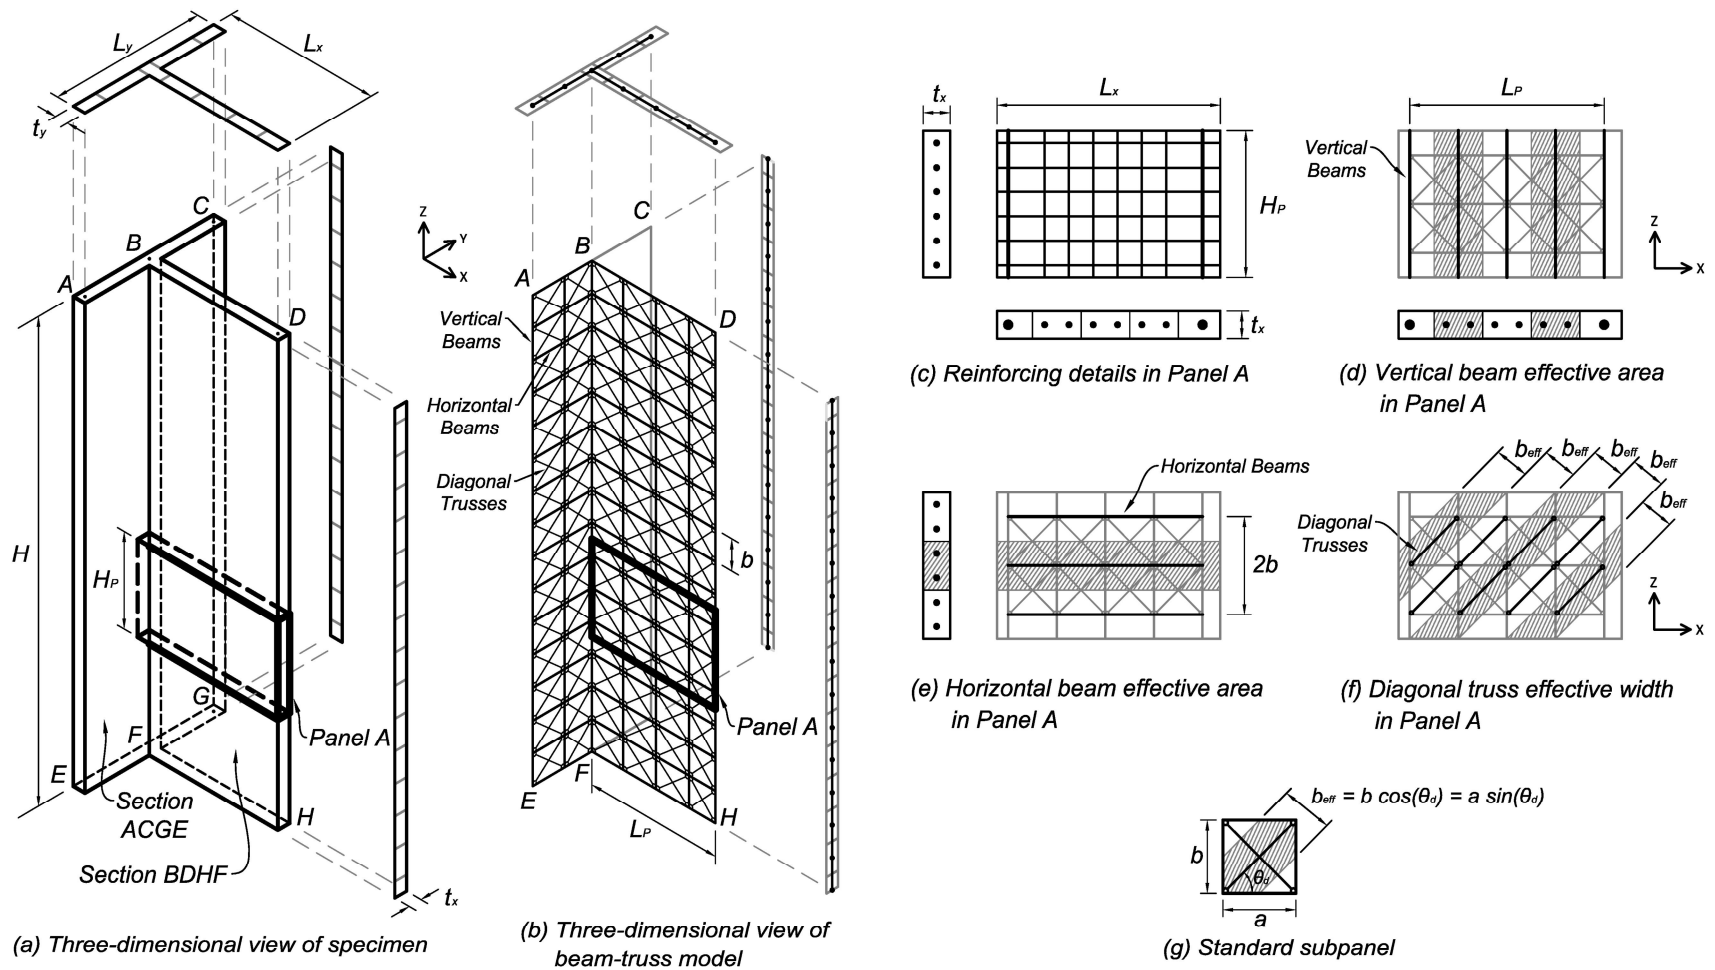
Three-dimensional view of the beam-truss model approach for a T-shape section wall.
